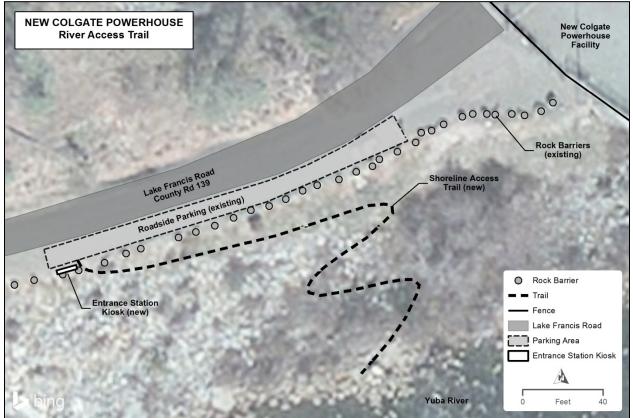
Conceptual layout for the New Colgate Powerhouse river access improvements.
